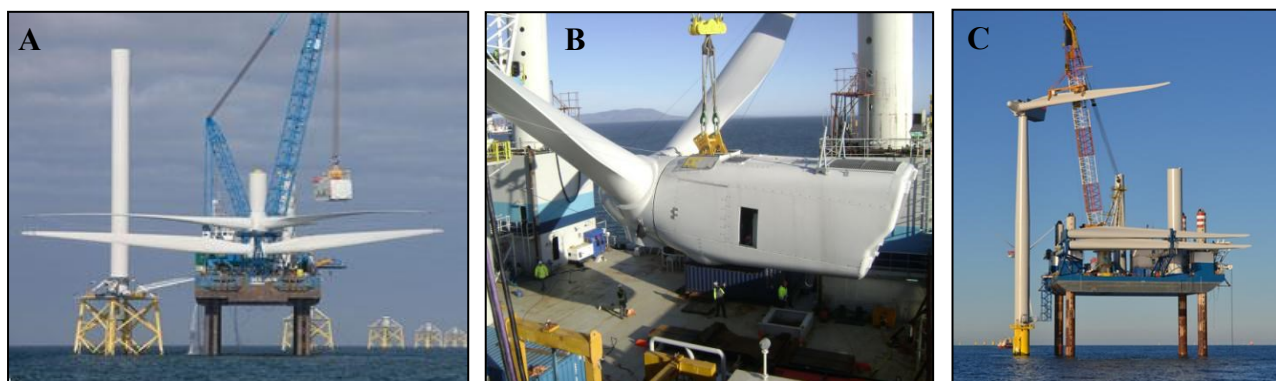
Lifting the nacelle on top of the tower before rotor installation (A); Bunny-ear installation method (B); One-by-one blade installation (C)
